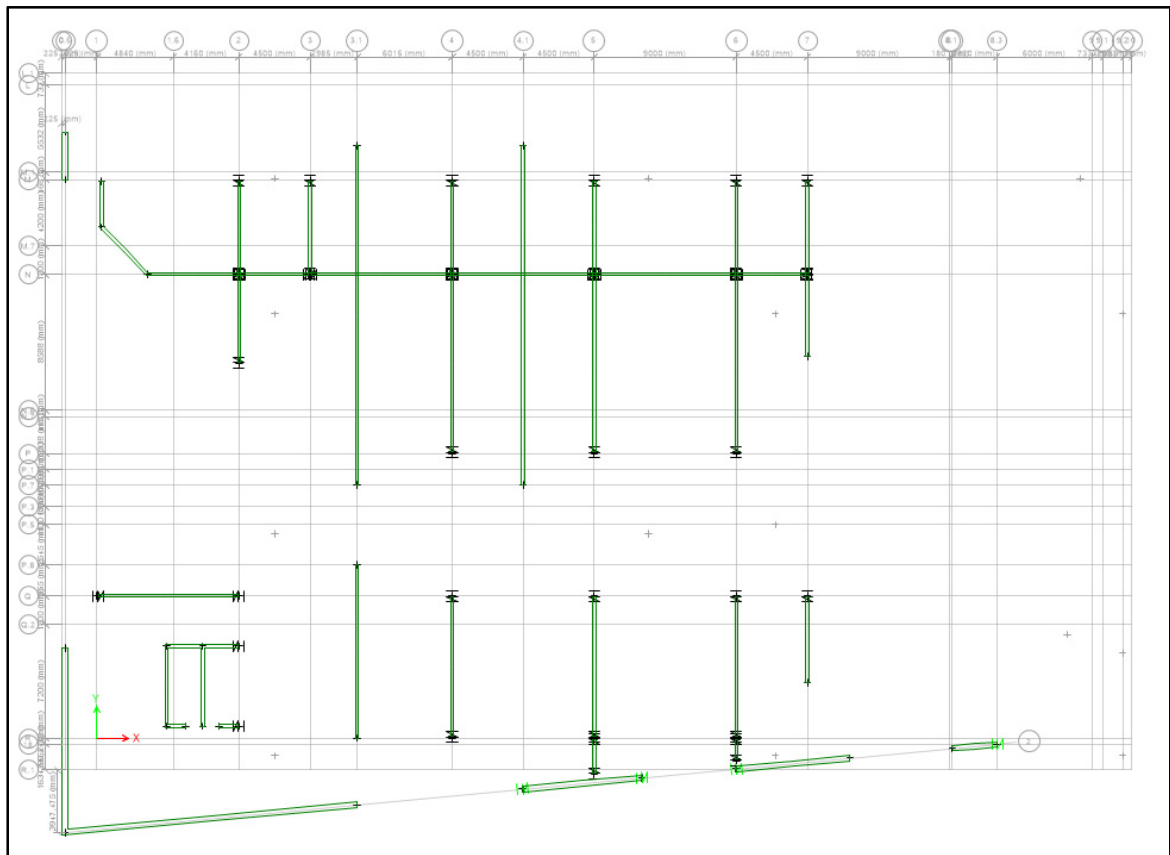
Plan view of masonry walls in the ground floor floor
